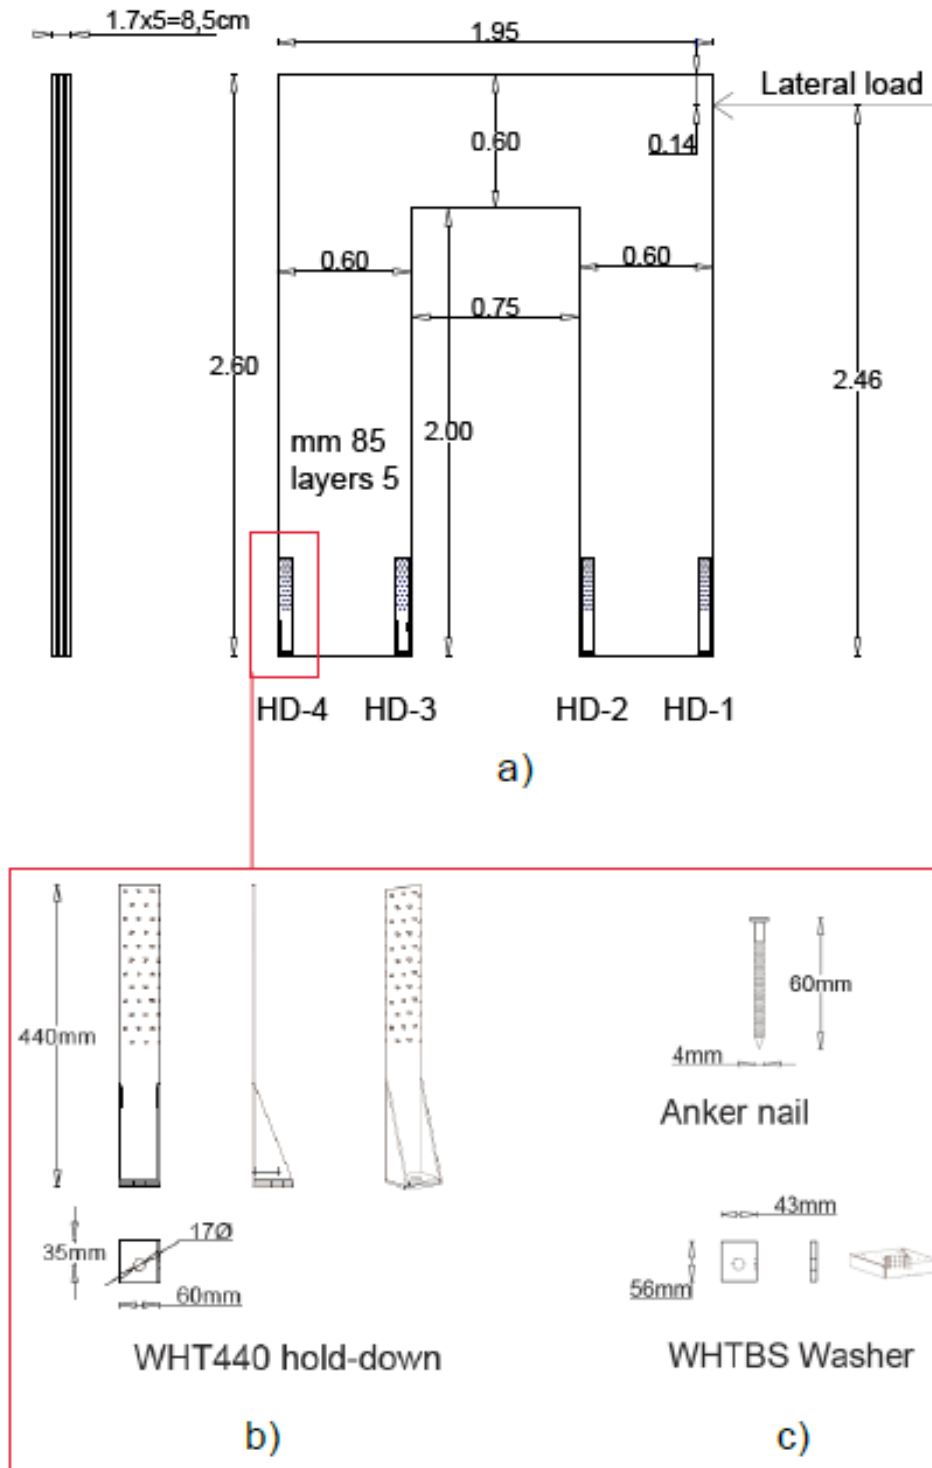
Detailing sketch of geometric configuration and connection system of shearwall 01
